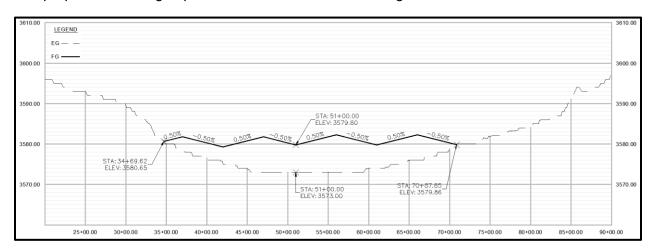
Proposed 1% LOS upstream cross section at Tradewinds and Farmers at Playa Lake 18.
